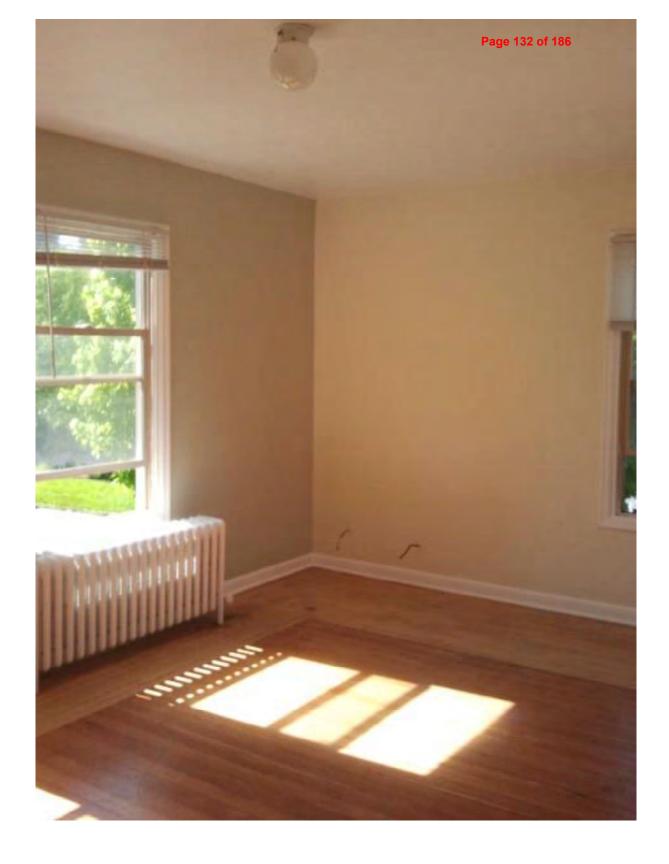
Newton Apartments, Typical First Floor unit, Unit 8, original oak/fir flooring, looking southeast, 2018. Source: Owner.
